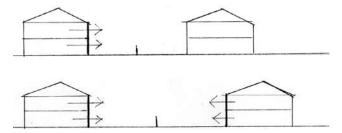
sketch shows the distance between principal windows and a blank wall should be no less than 15 metres. Principal window facing another property with principle windows should have a distance of 21 metres.
